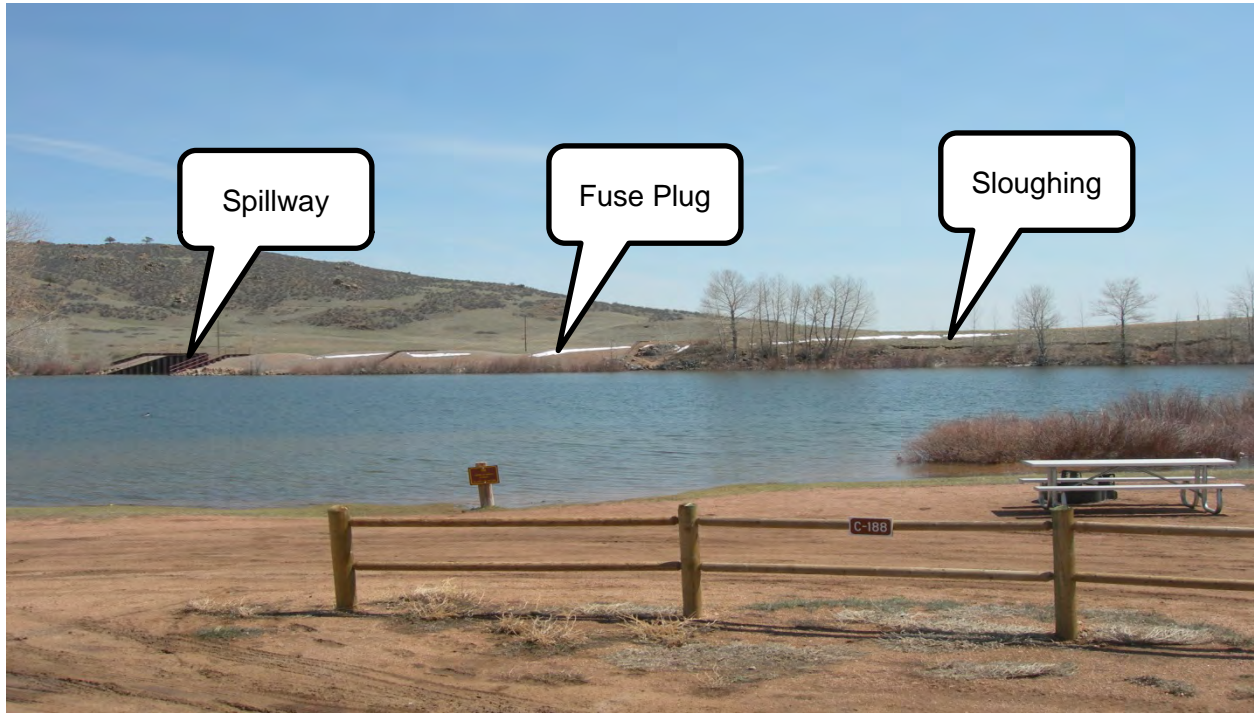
Crystal Lake spillway and fuse plugs. Notice sloughing of the existing ground to the right of the fuse plugs. See Photo 2. (May 6, 2013)
